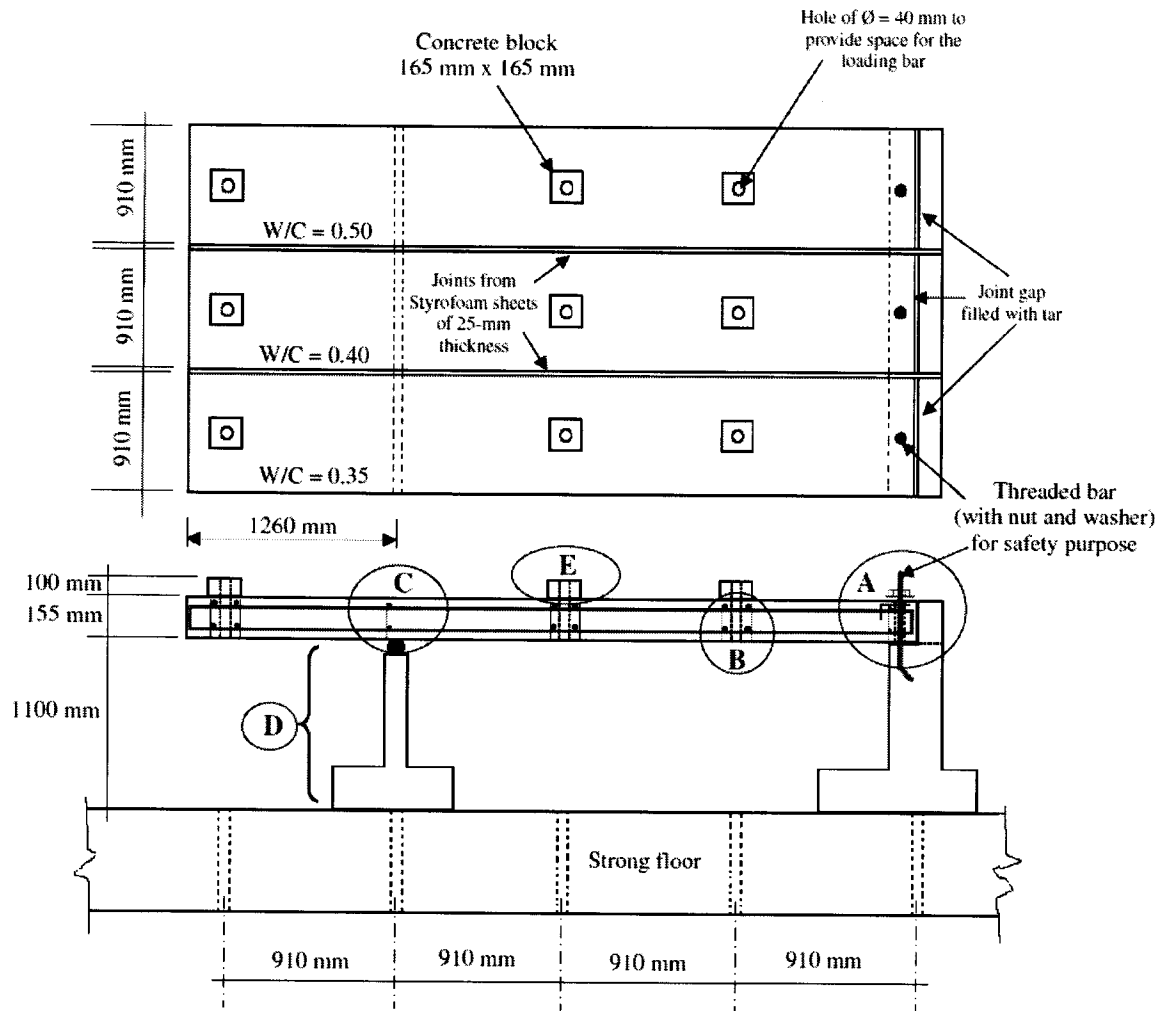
Plan and elevation views of the bridge deck (dimensions not to scale).
